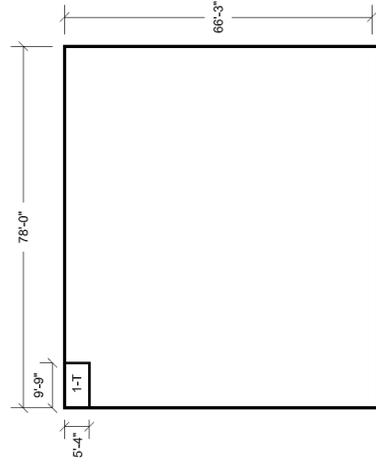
H.6.74A: PUMP HOUSE INTERNAL EAST WALL LOOKING WEST
